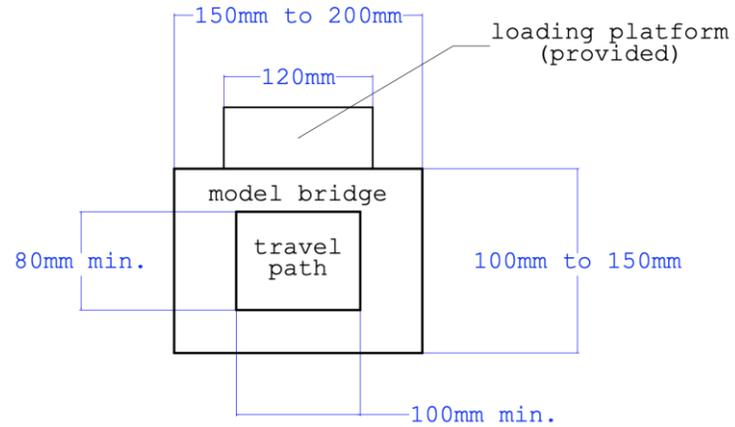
END VIEW DIMENSION OF MODEL BRIDGE WITH LOADING AT CENTER AND CLEAR TRAVEL PATH THROUGH THE BRIDGE.
